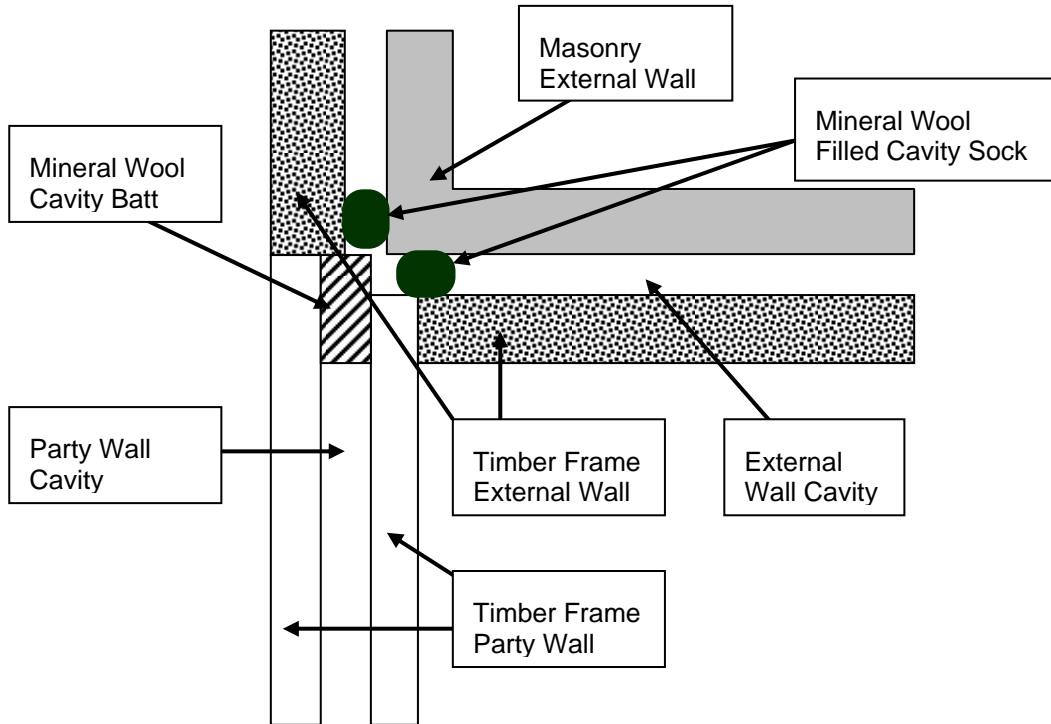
Schematic of Staggered External Wall Junction from Robust Detail E-WT-1 (Robust Details 2009)
